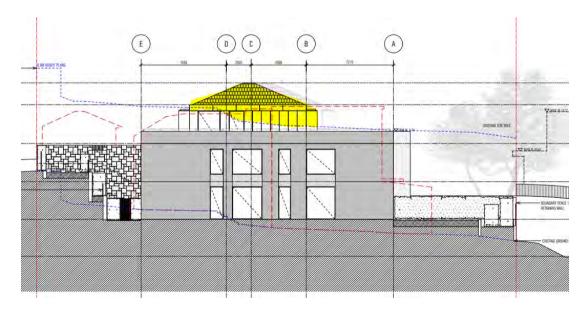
Western elevation of building W1/W2 - Plan DA11, showing blue dashed 8.5m height line and section of western building over the height limit, shaded yellow. (Mathieson Arch)
